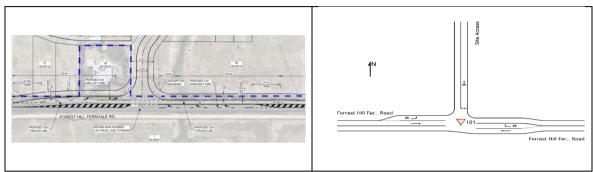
Concept Layout and SIDRA Layout - Forest Hill Fernvale Road / Site Access
